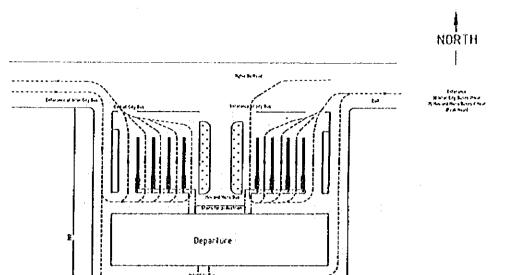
Plan of Gia Lam Terminal Improvement
